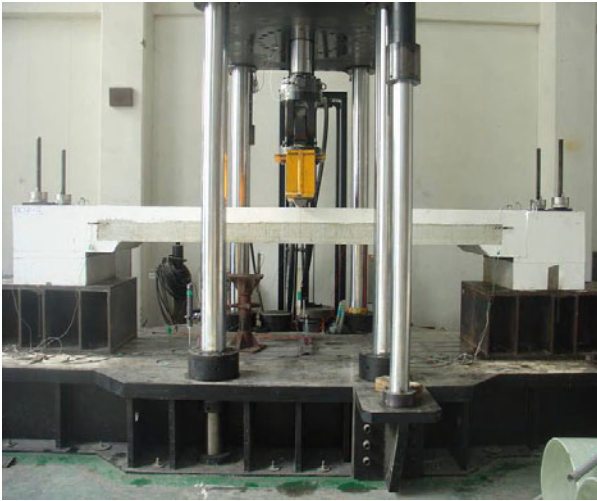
Testing of the precast FRP-concrete composite deck specimens
